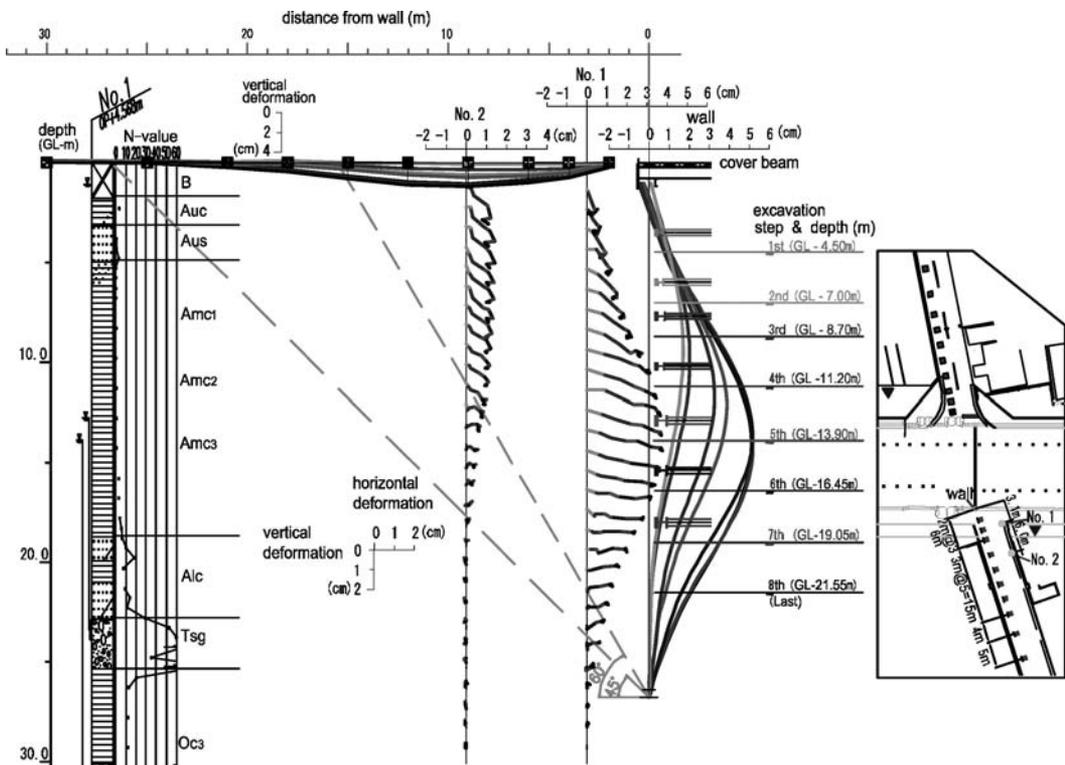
Earth retaining wall deflection, backside ground deformation vector and distribution of backside ground surface settlement at the A-site.
